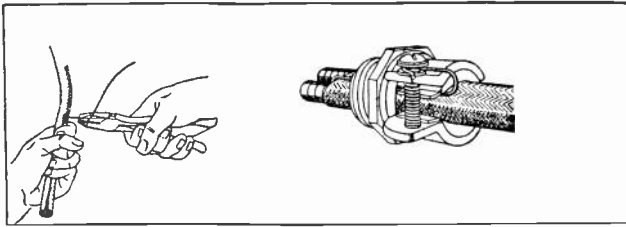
This sketch shows the method of stripping back the extra ground wire in non-metallic sheathed cable, and also the manner in which it is attached to the outlet box clamp.
